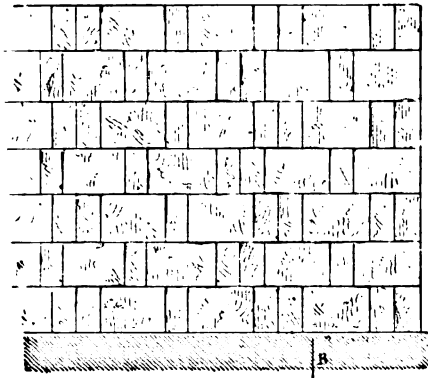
Elevation of wall, Khorsabad ; from Place.
